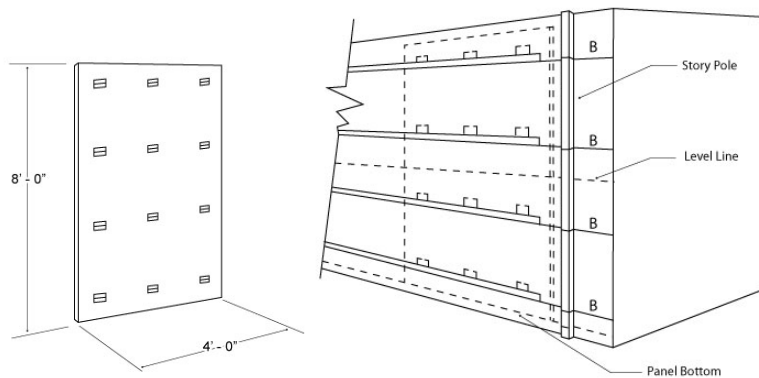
A schematic shows how clips work with Stonewood Panels for interior wall installation
